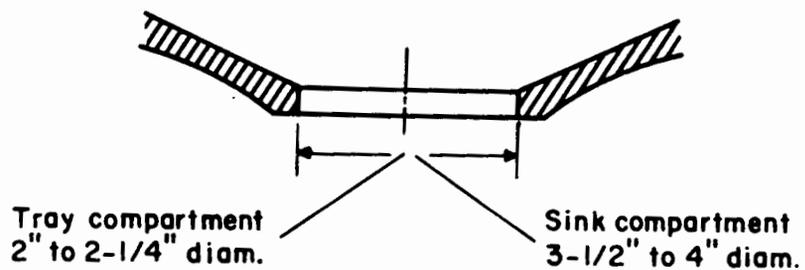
Sink and laundry tray combinations, outlet dimensions. (4.4. (2))
